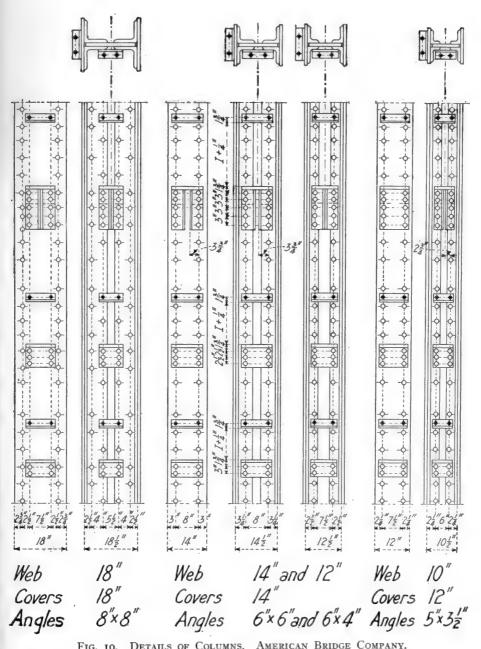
DETAILS OF COLUMNS. AMERICAN BRIDGE COMPANY.
